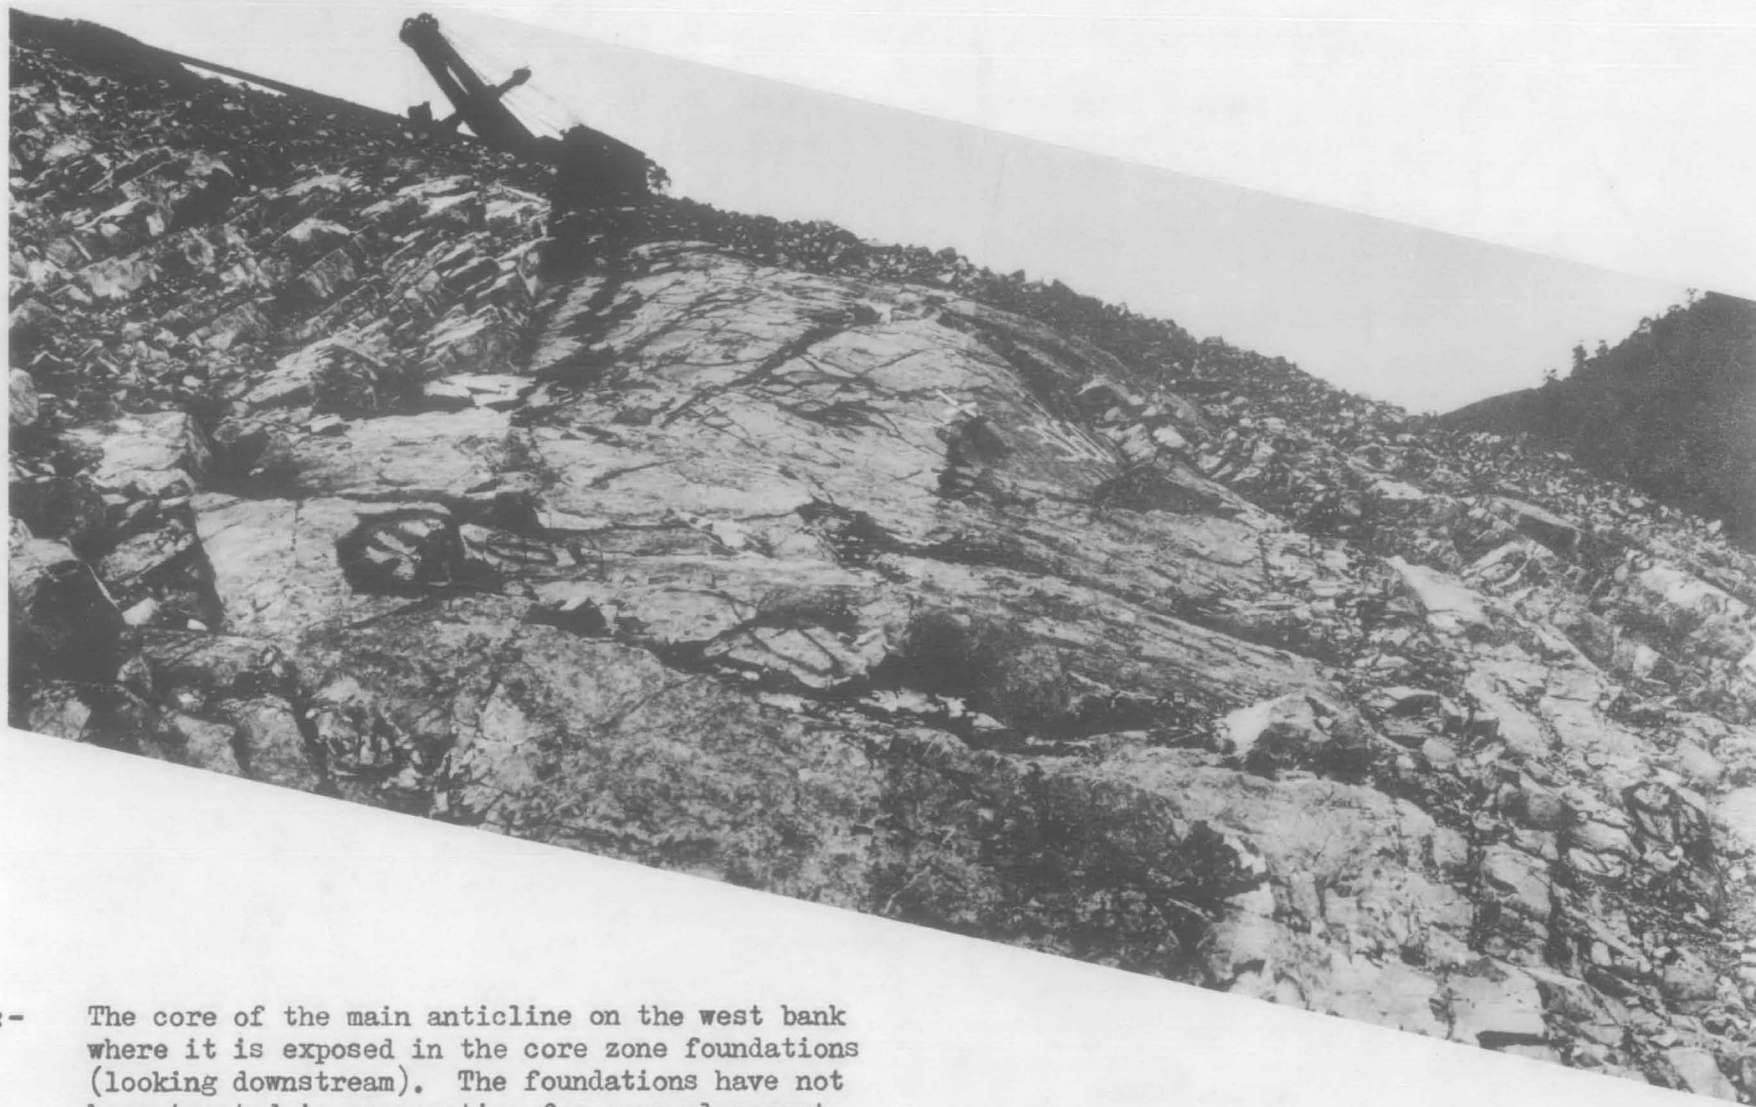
The core of the main anticline on the west bank where it is exposed in the core zone foundations (looking downstream). The foundations have not been treated in preparation for core placement. The white cross on the rock marks the point 220 E, 1020 N on the dam grid.
